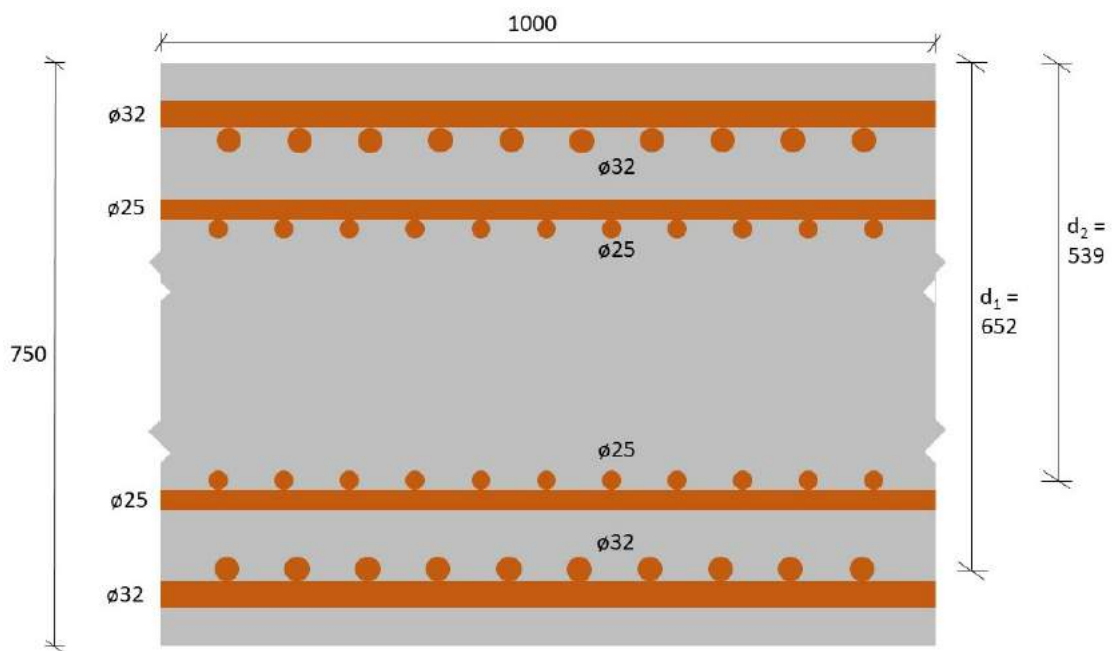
Cross-section of a 0,75 m thick floor element.
